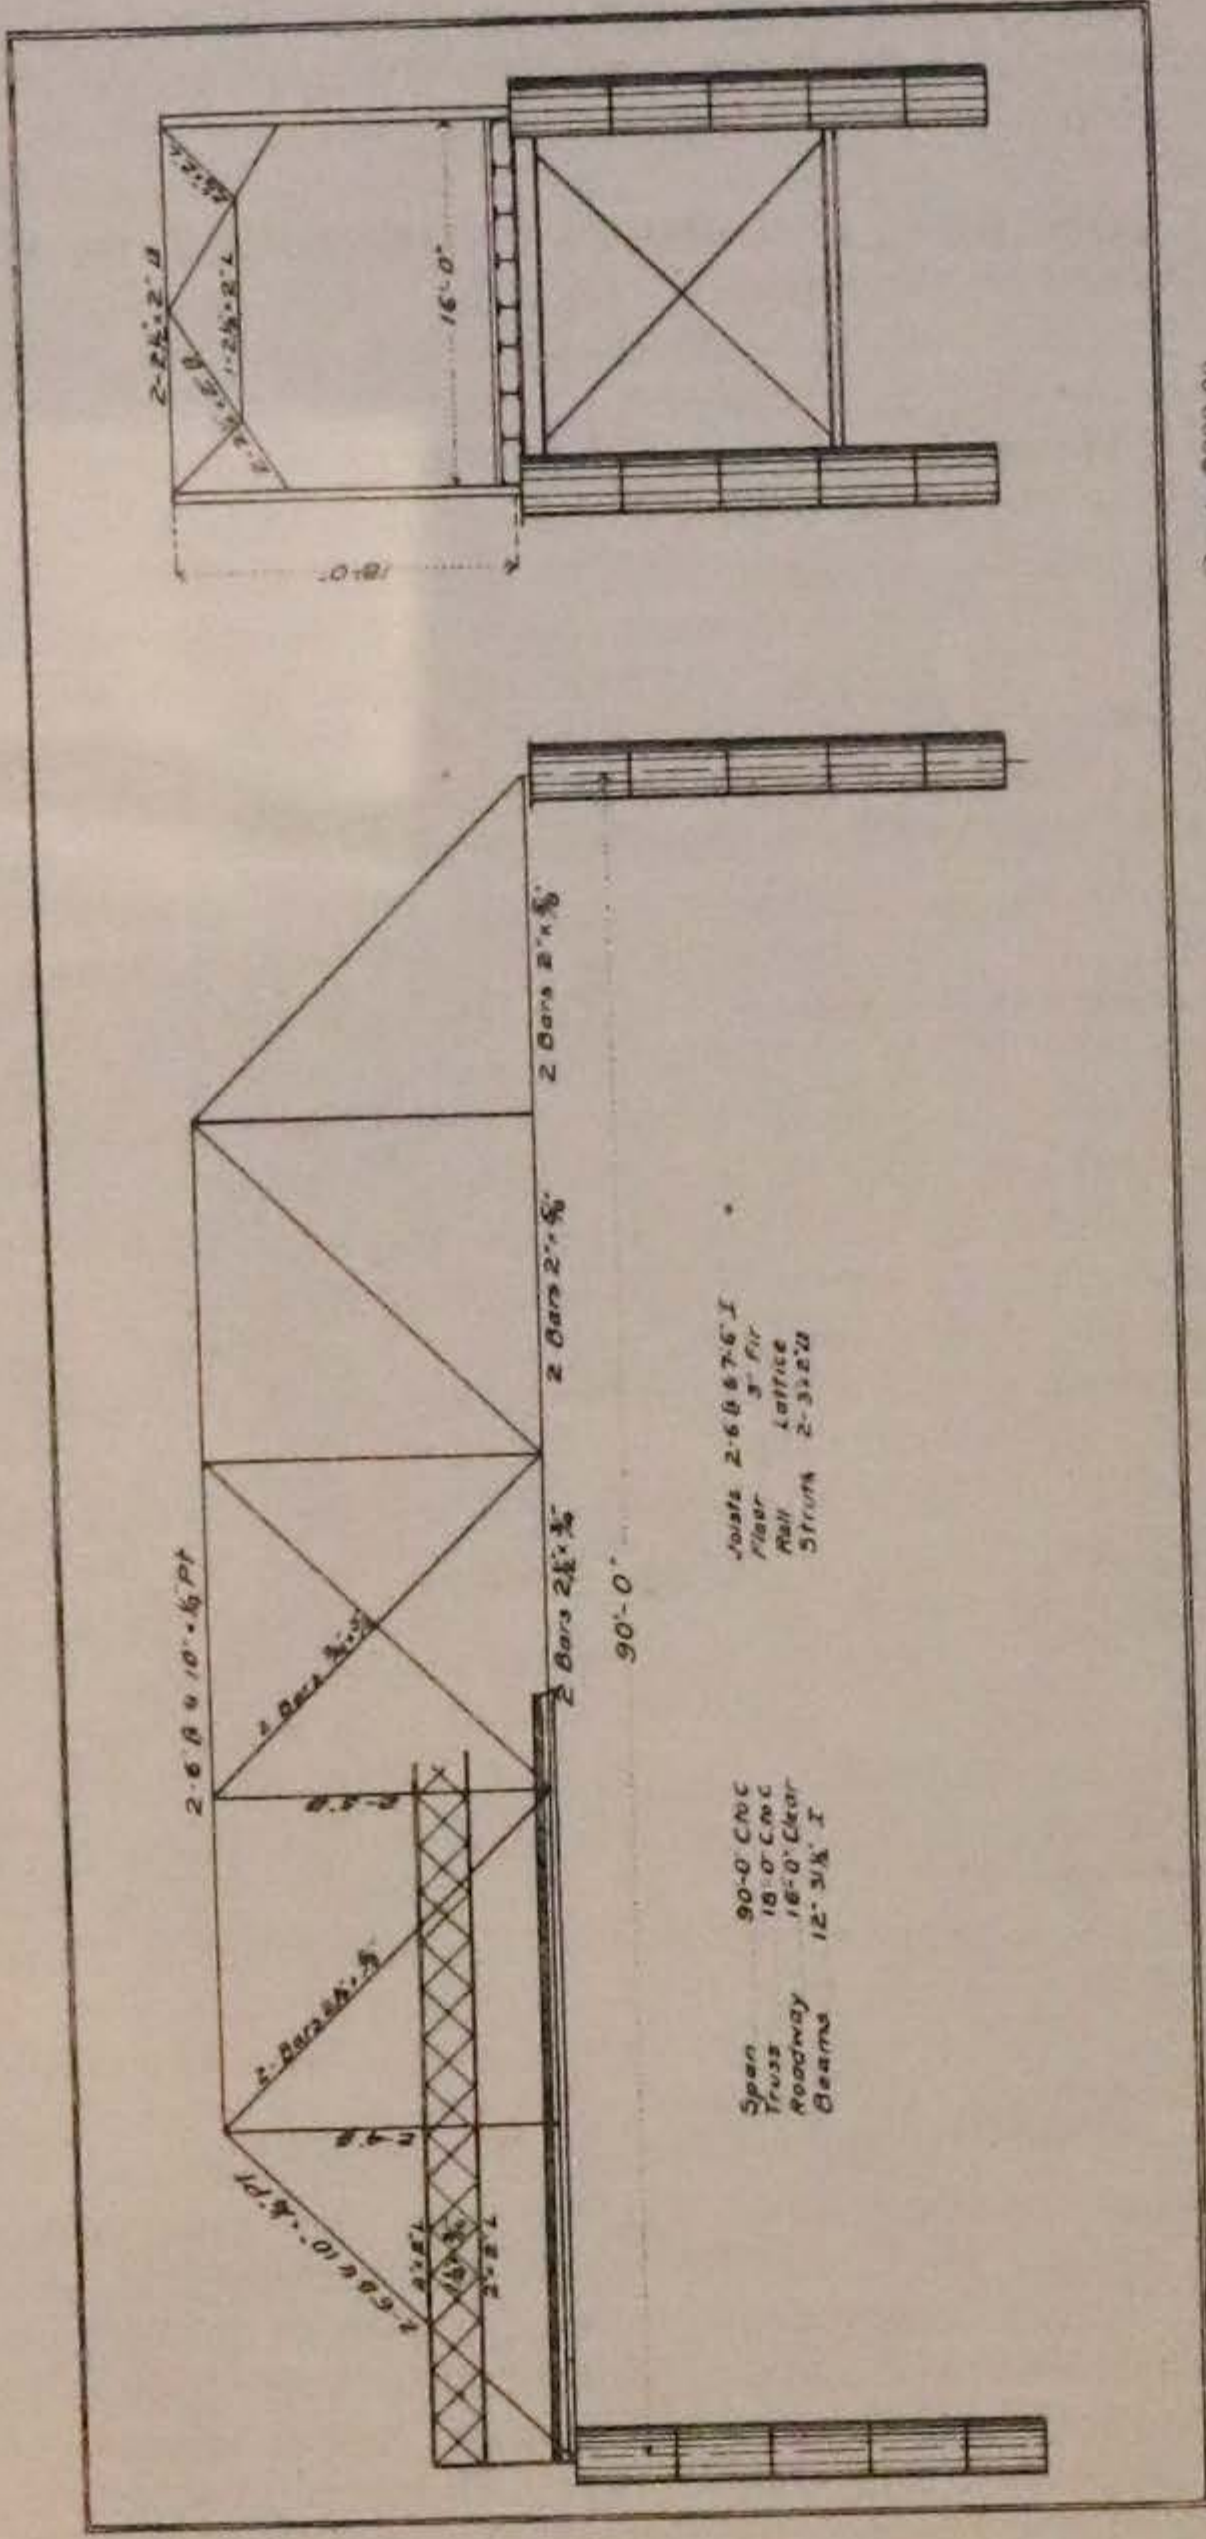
Plan of 90 Foot Steel Bridge. Submitted as complete plans and specifications. Cost, \$200.00
